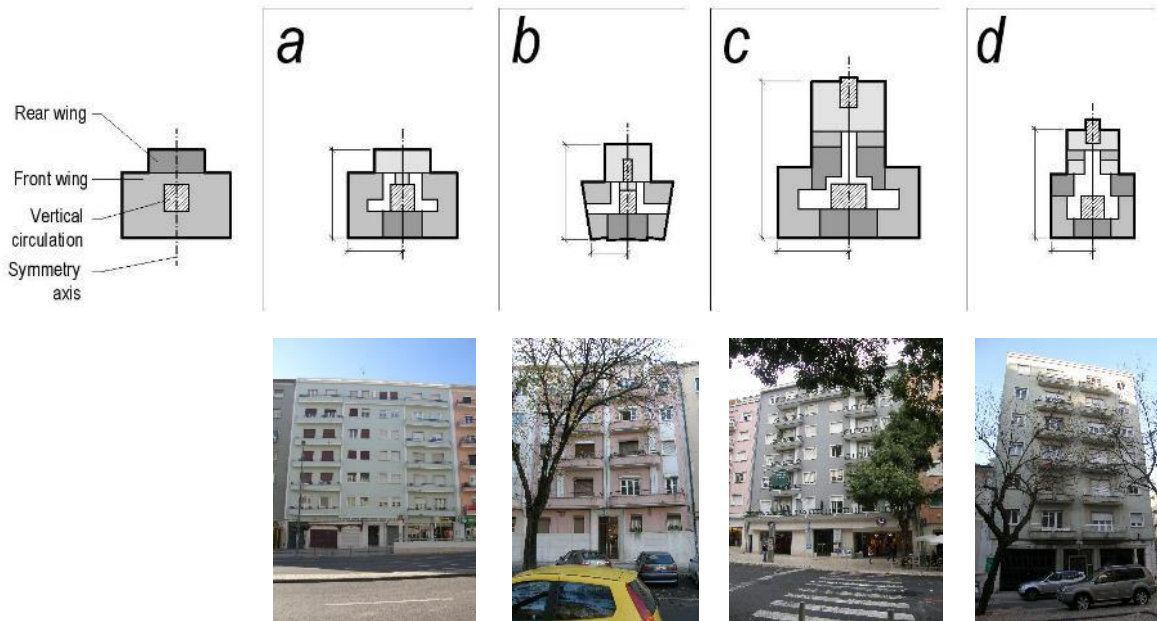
General floor plan and four Rabo-de-Bacalhau building types with example façade.
